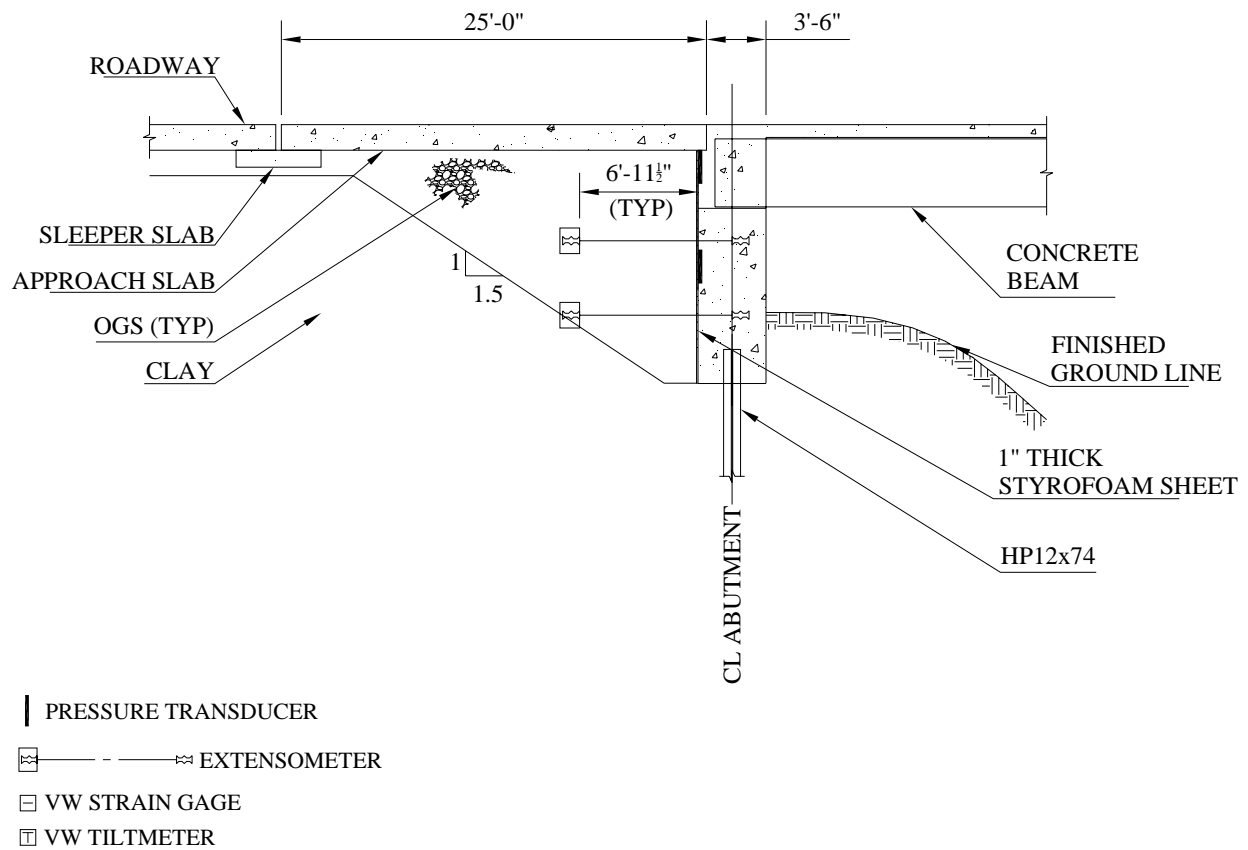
Structure 222 Cross-Section Through Abutment 2 (Section A-A).
